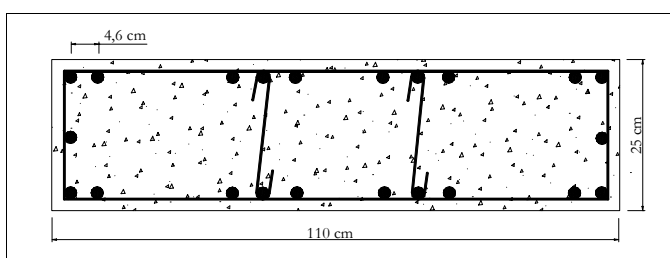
Case 5: Arrangement of reinforcement in cross section of column P1.
